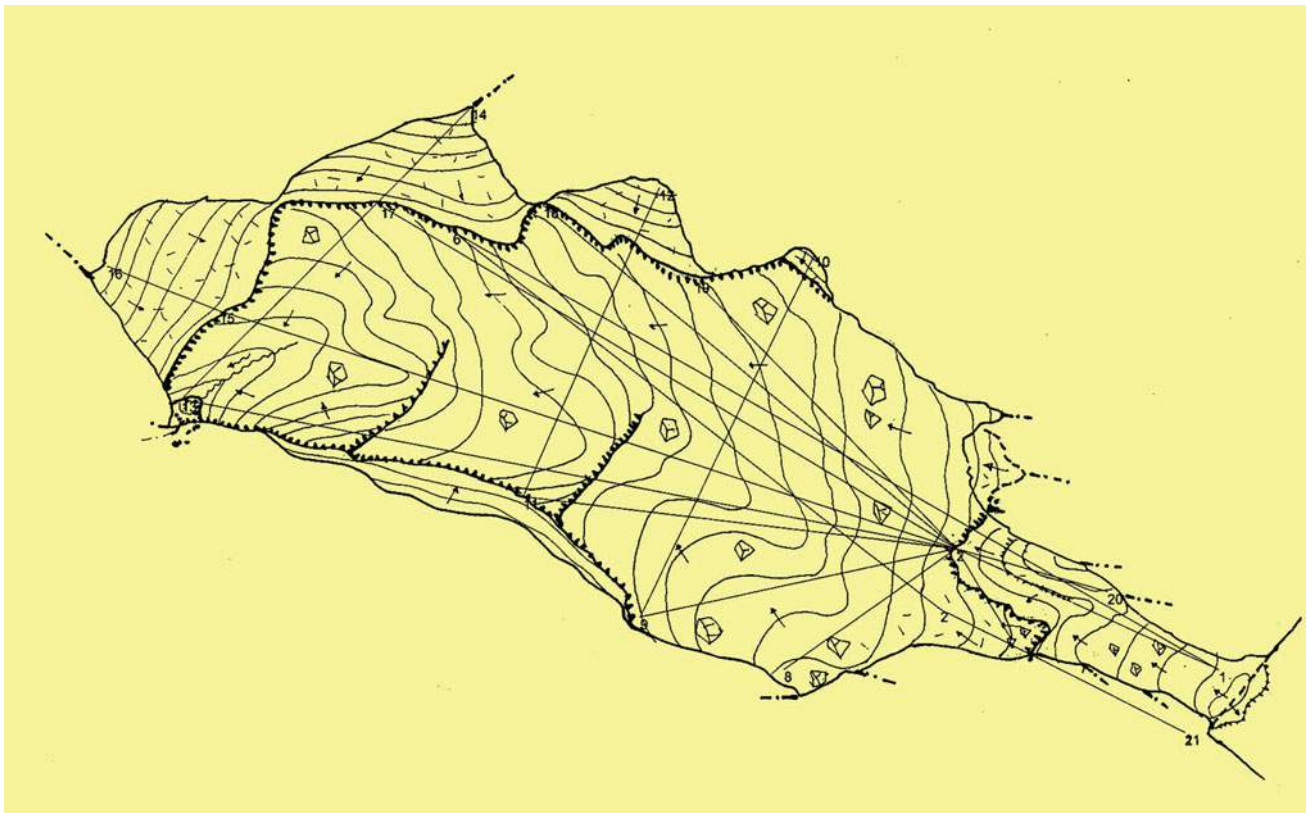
Plan of cavern at km 1 + 281 under pillar S-4 of Kačjak 2 Viaduct
